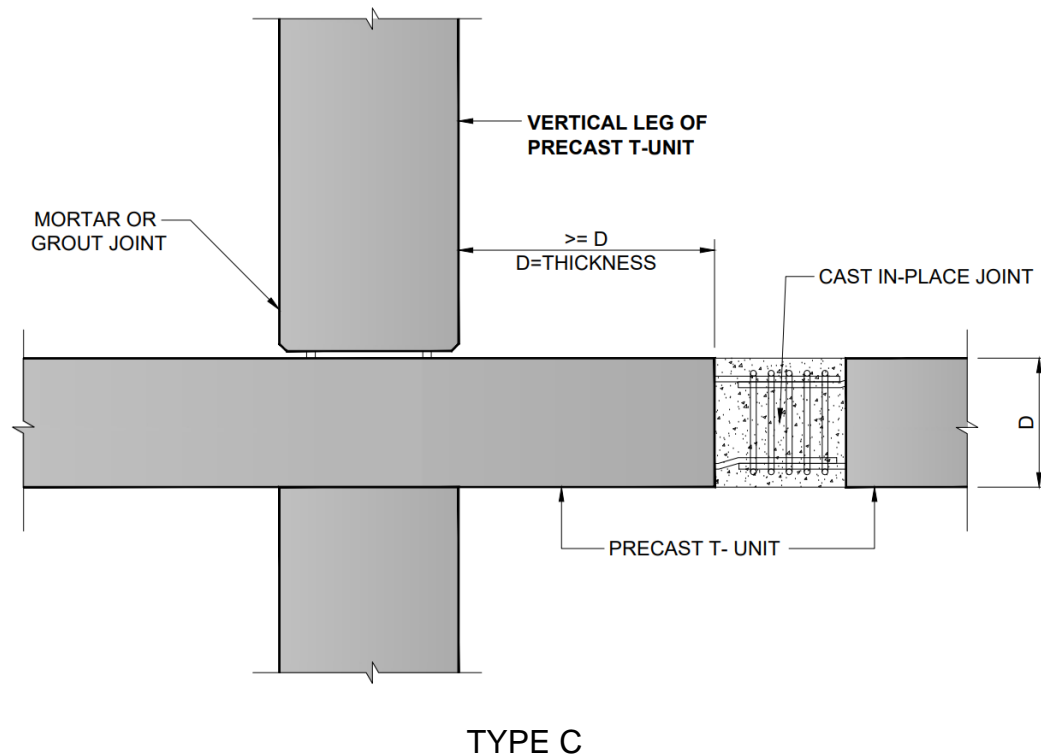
PRECAST BEAM-COLUMN CONNECTION
